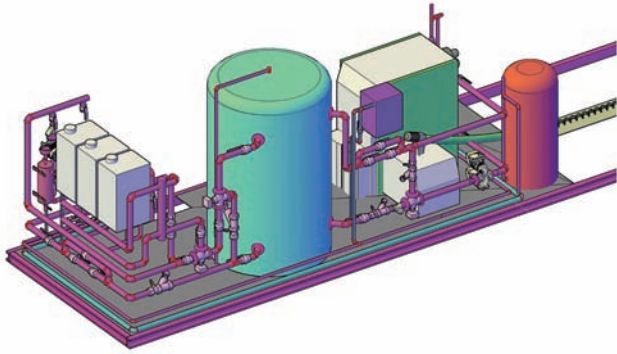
Cut-away 3-D drawing of a packaged wood pellet boilerhouse with 199 kW boiler
